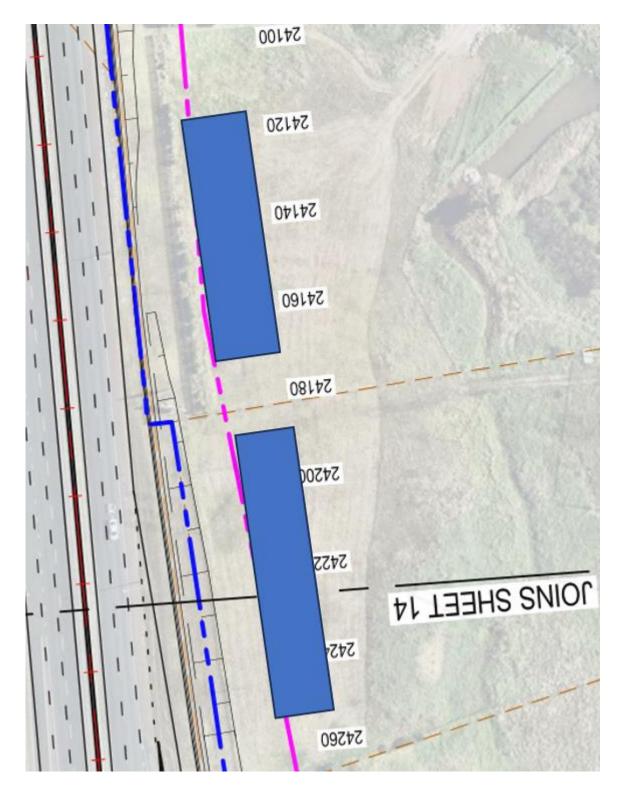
location of existing buildings on submitters land shown on General Arrangement Plan.
